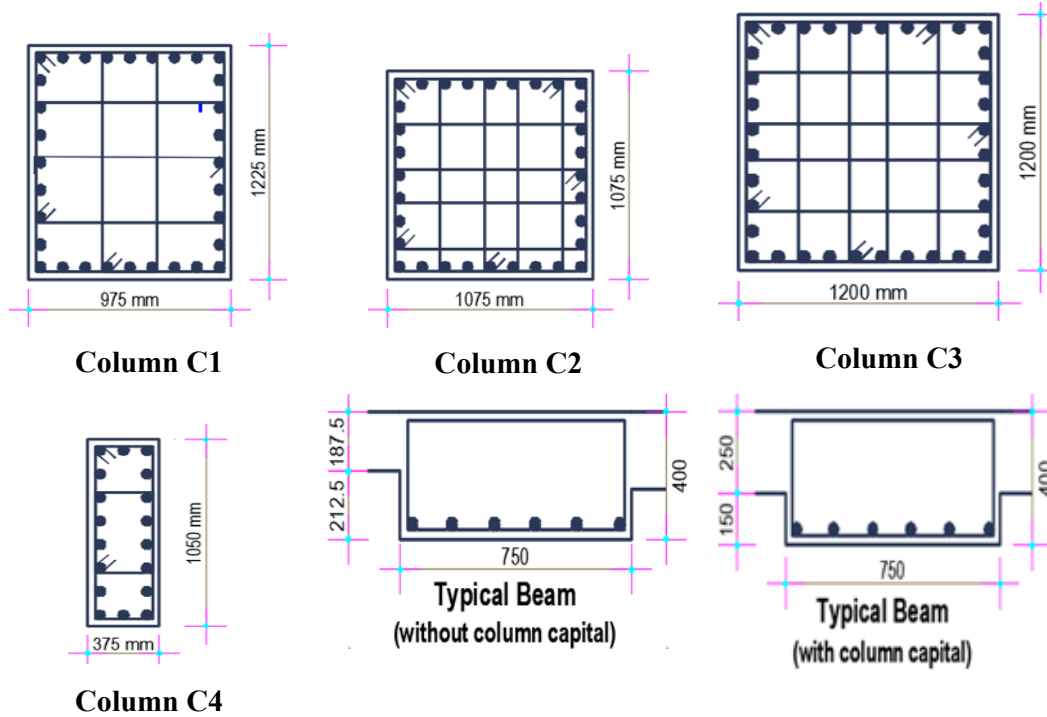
Cross-section of columns and beam with rebar arrangements.
